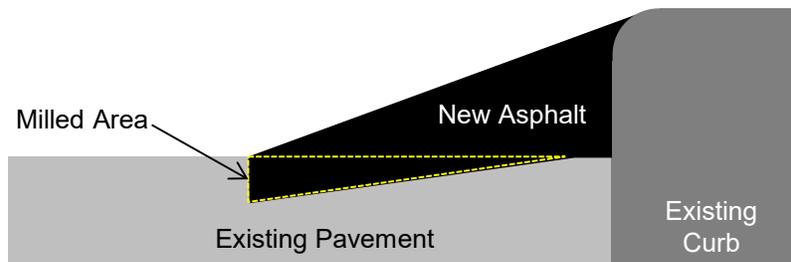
Milling detail for asphalt wedges used as curb ramps.
